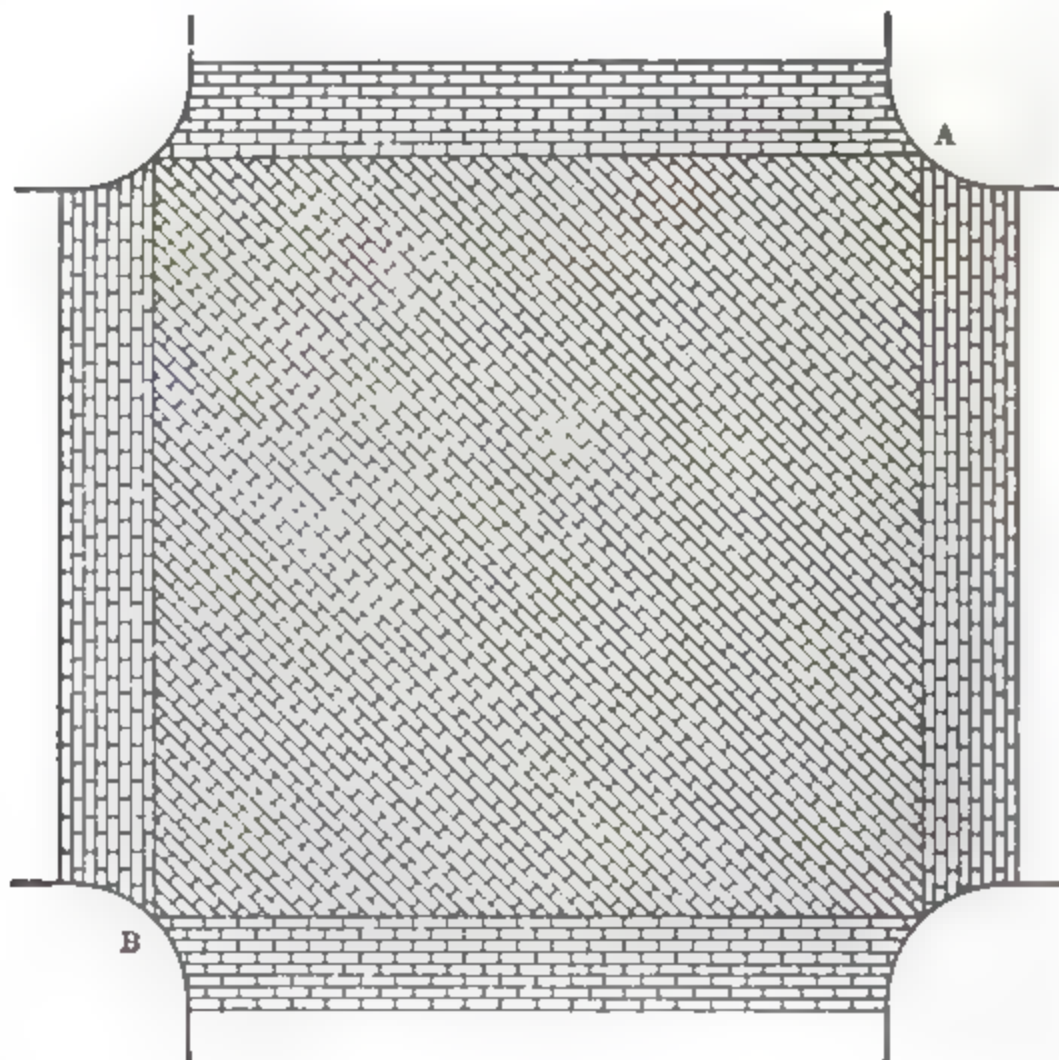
SINGLE-DIAGONAL BRICK INTERSECTION.
